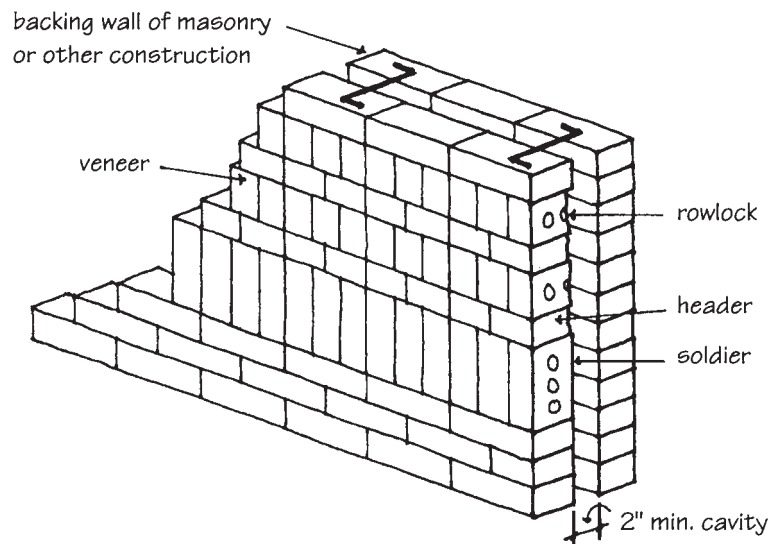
Half rowlocks and half headers used in a cavity wall to simulate the appearance of a masonry bonded wall.
